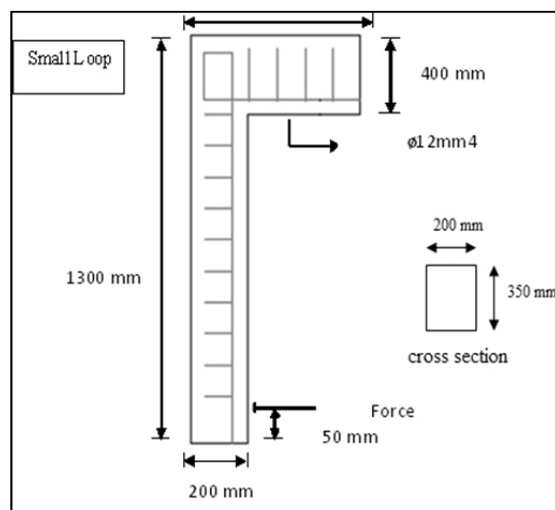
Small Loop Reinforcement Detail (SL2).^[9]
